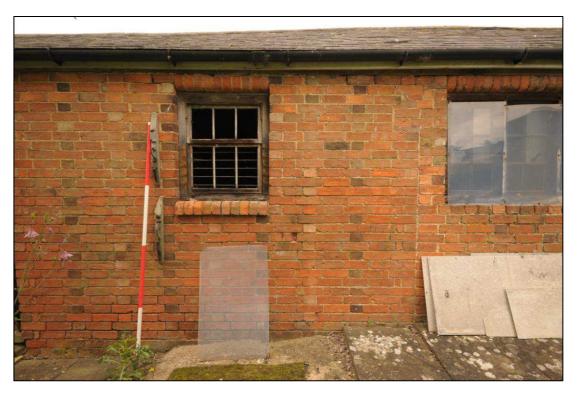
West range: showing east wall of stable and tack room (shows straight join between brickwork of stable and tack room on the right)
